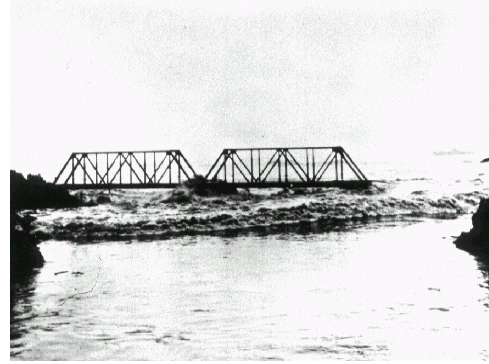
Tsunami wave destroyed bridges on Wailuku River, HI, 1946
